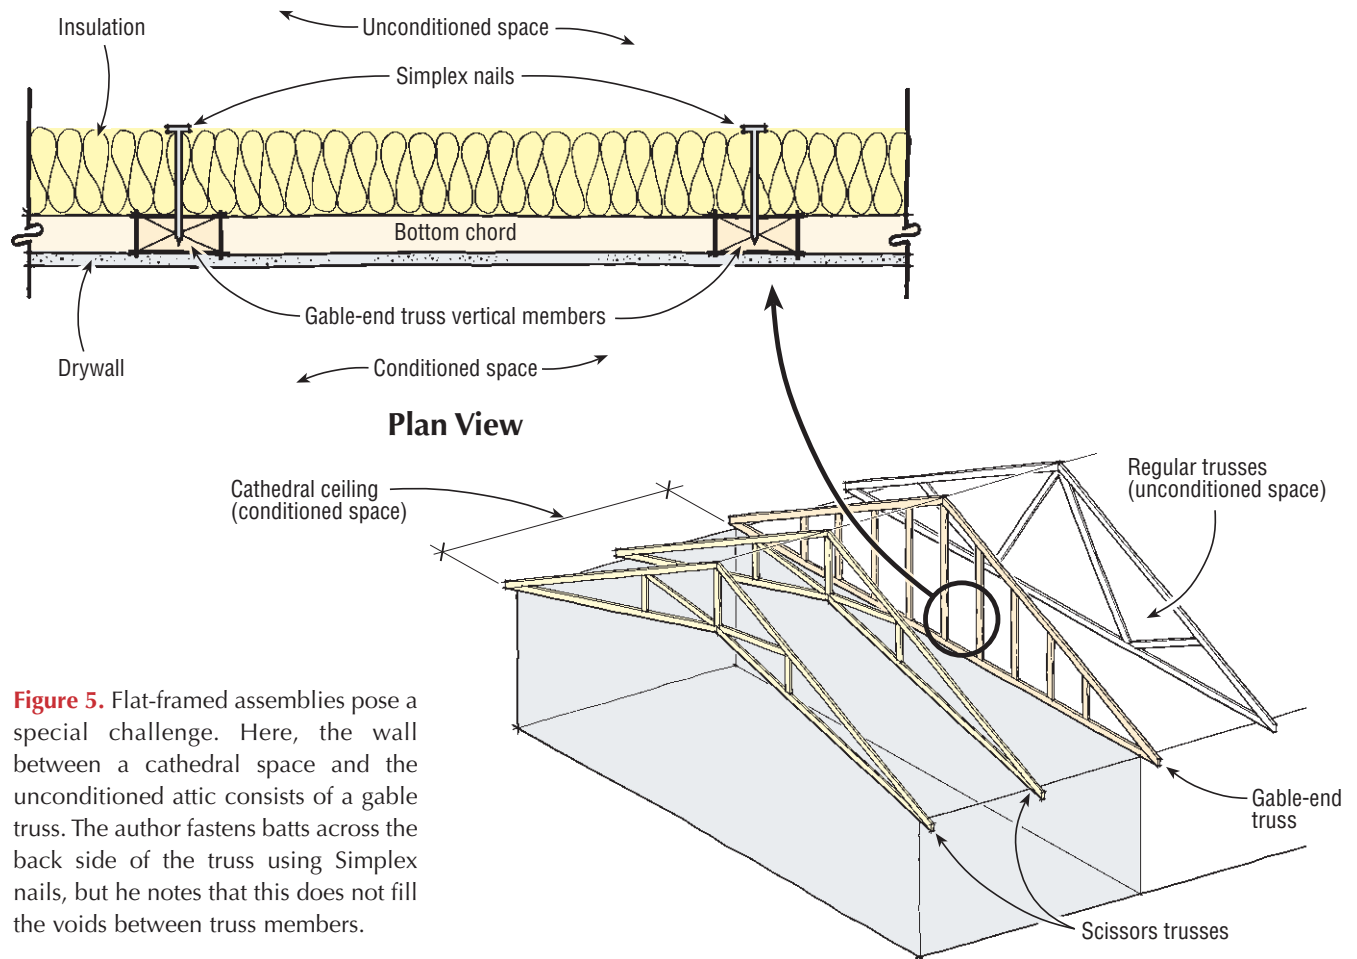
Flat-framed assemblies pose a special challenge. Here, the wall between a cathedral space and the unconditioned attic consists of a gable truss. The author fastens batts across the back side of the truss using Simplex nails, but he notes that this does not fill the voids between truss members.
